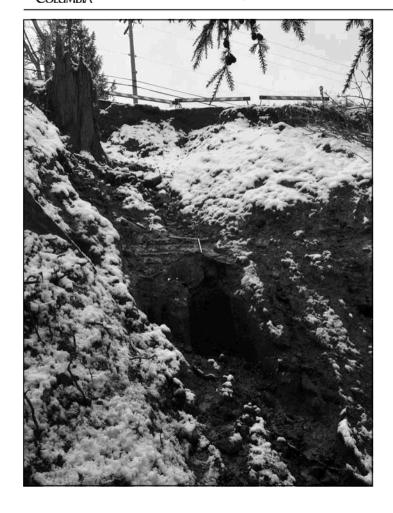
View of failure surface from below. Ruler placed on silt layer in track.
